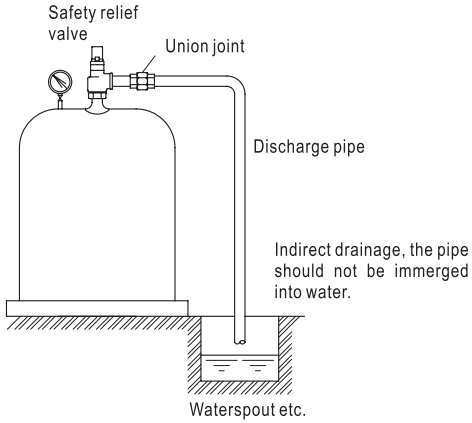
Example: Installation of the secondary side of pressure reducing valve
